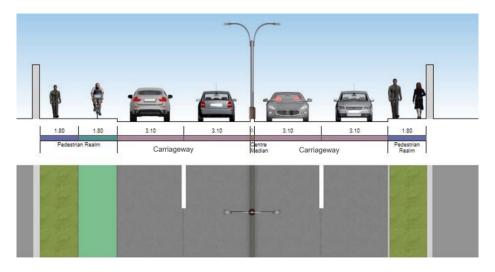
Cross section of road with 18m ROW with Cycle Track
